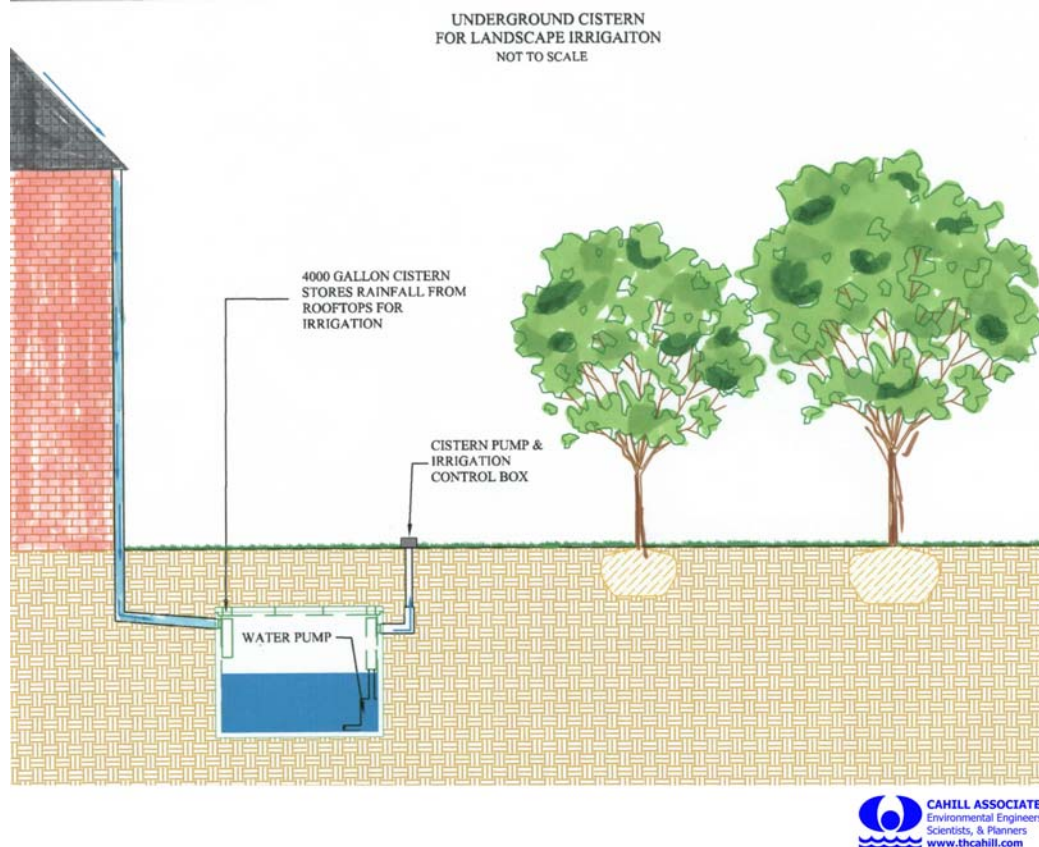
Schematic cross-section showing roof runoff connected to underground cistern.
